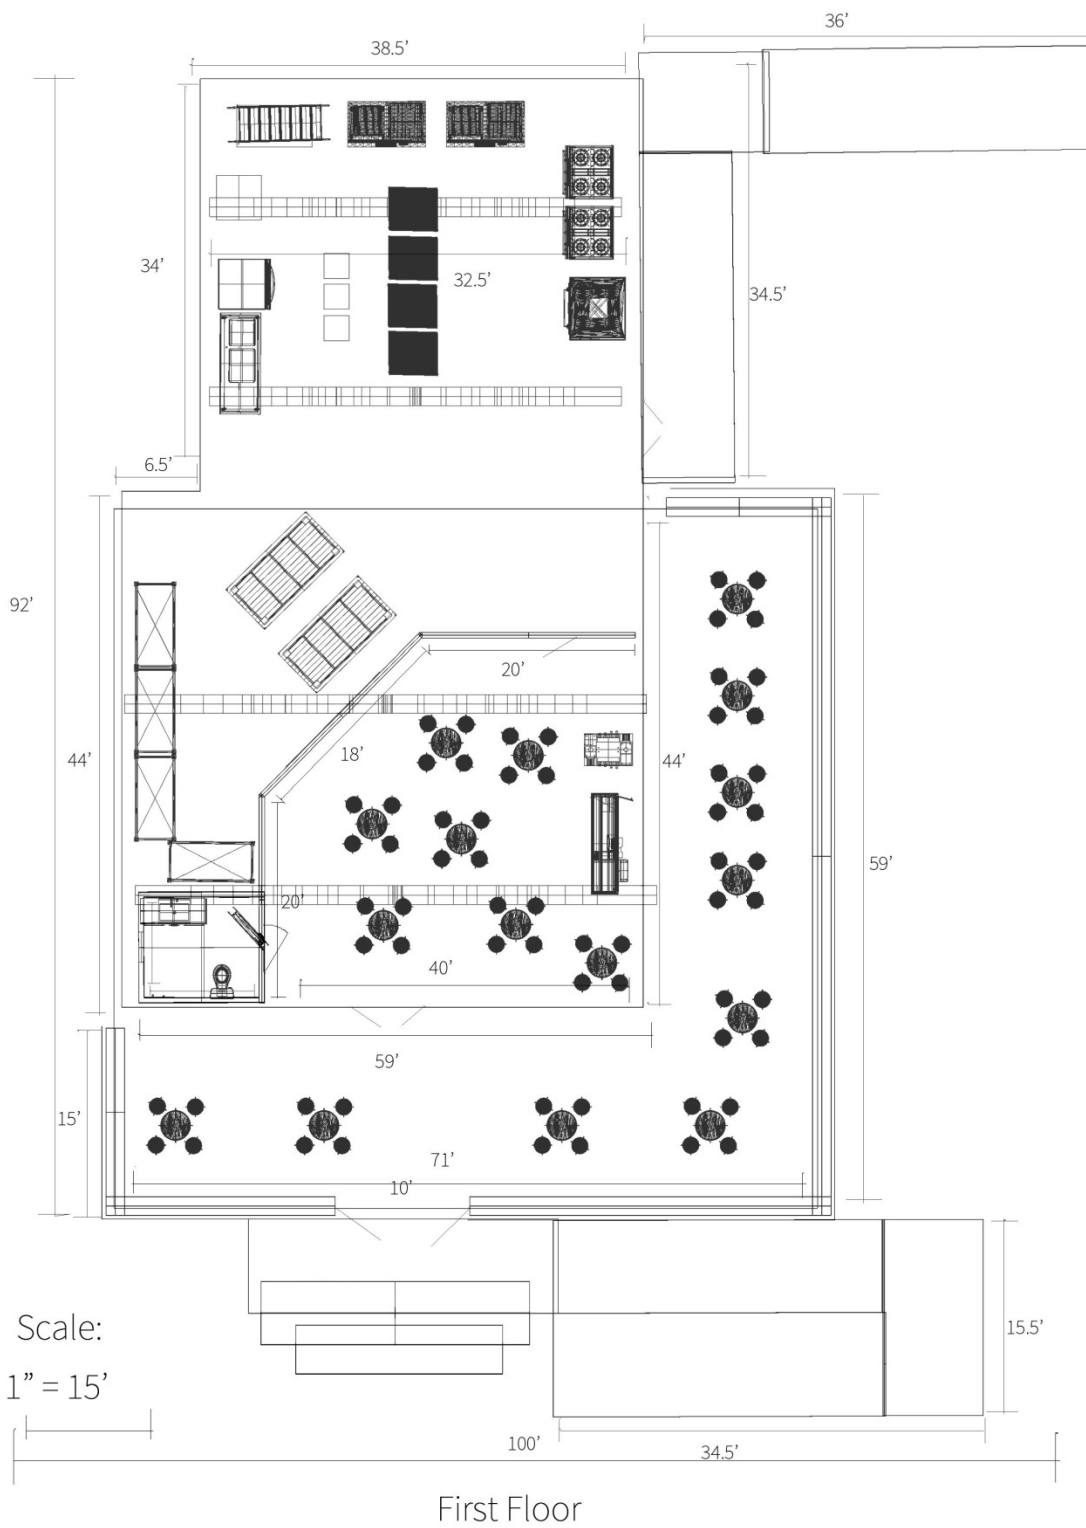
New floor plan for first floor, with bakery and a partly separate sitting area.
